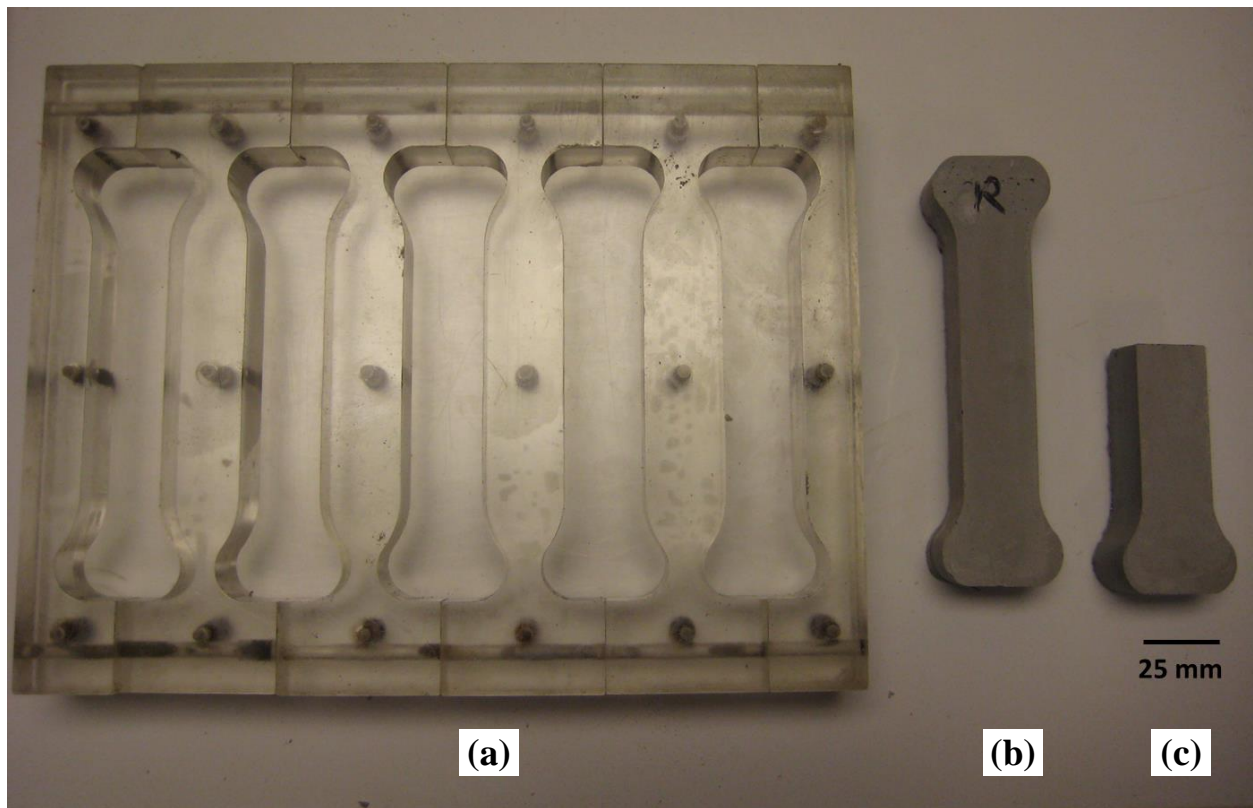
(a) UHP-FRC mold for tension testing; (b) A UHP-FRC specimen for low strain rates testing used in Chapter 3; (c) A UHP-FRC specimen cut to desired length
